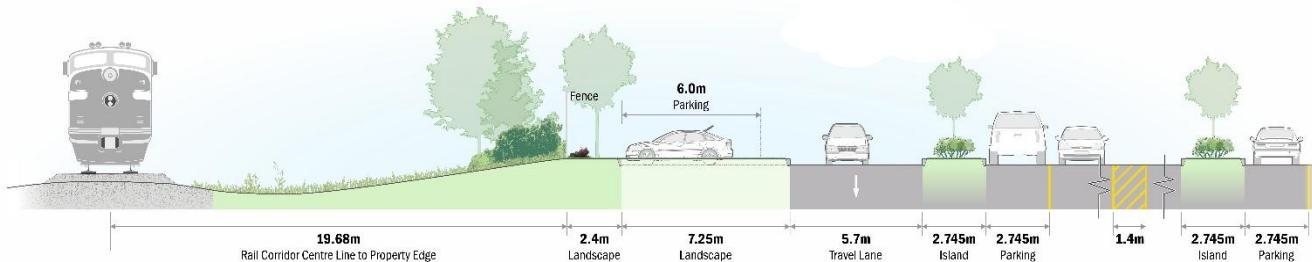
Development Cross-Section of the Proposed Main Building (Parsons, 2025).
